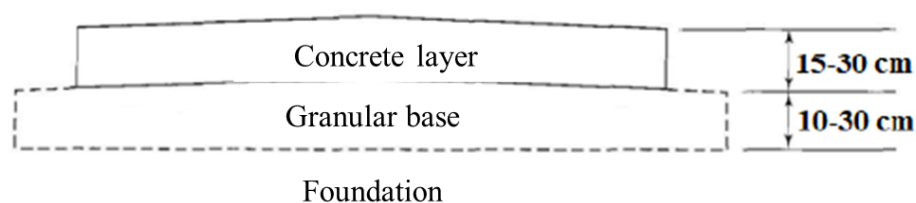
Cross-section of a rigid pavement. Source: Adapted from Pavement Analysis and Design (Huang 2004).
